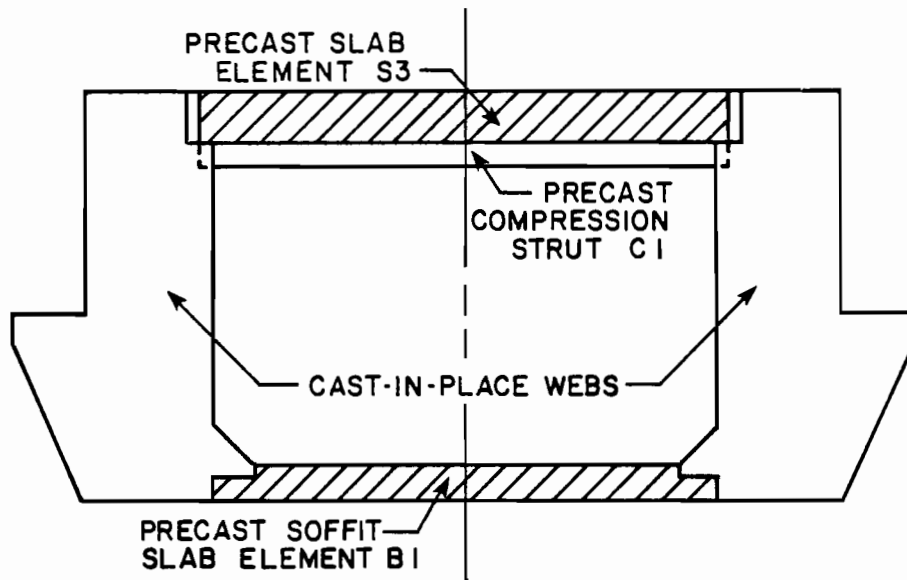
Typical spine beam cross section prior to wing or deck placement
